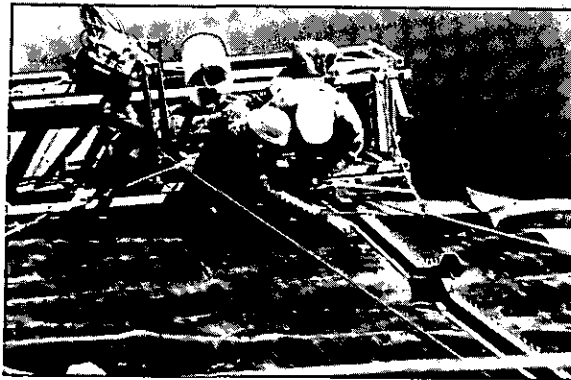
The internal profile is installed over the drainage geonet. Guide wires ensured vertical installation, particularly for underwater installation, performed with visibility from nil to 2 feet. Anchorage methods used were chemical epoxy capsules (above water) and shallow or deep expansion anchors (below water)
